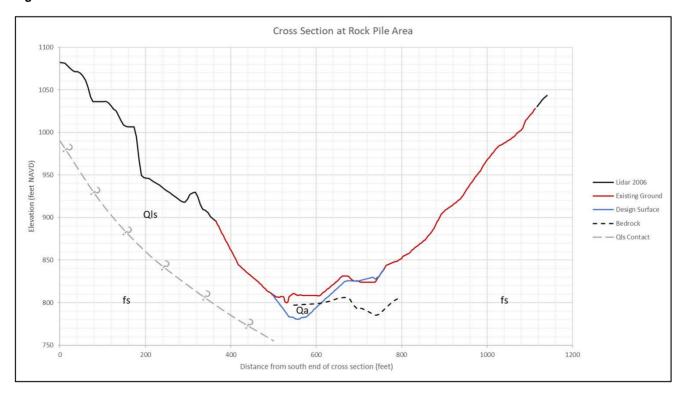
Cross section at the Rock Pile Area. Located at Thalweg Profile Station 97+00.
